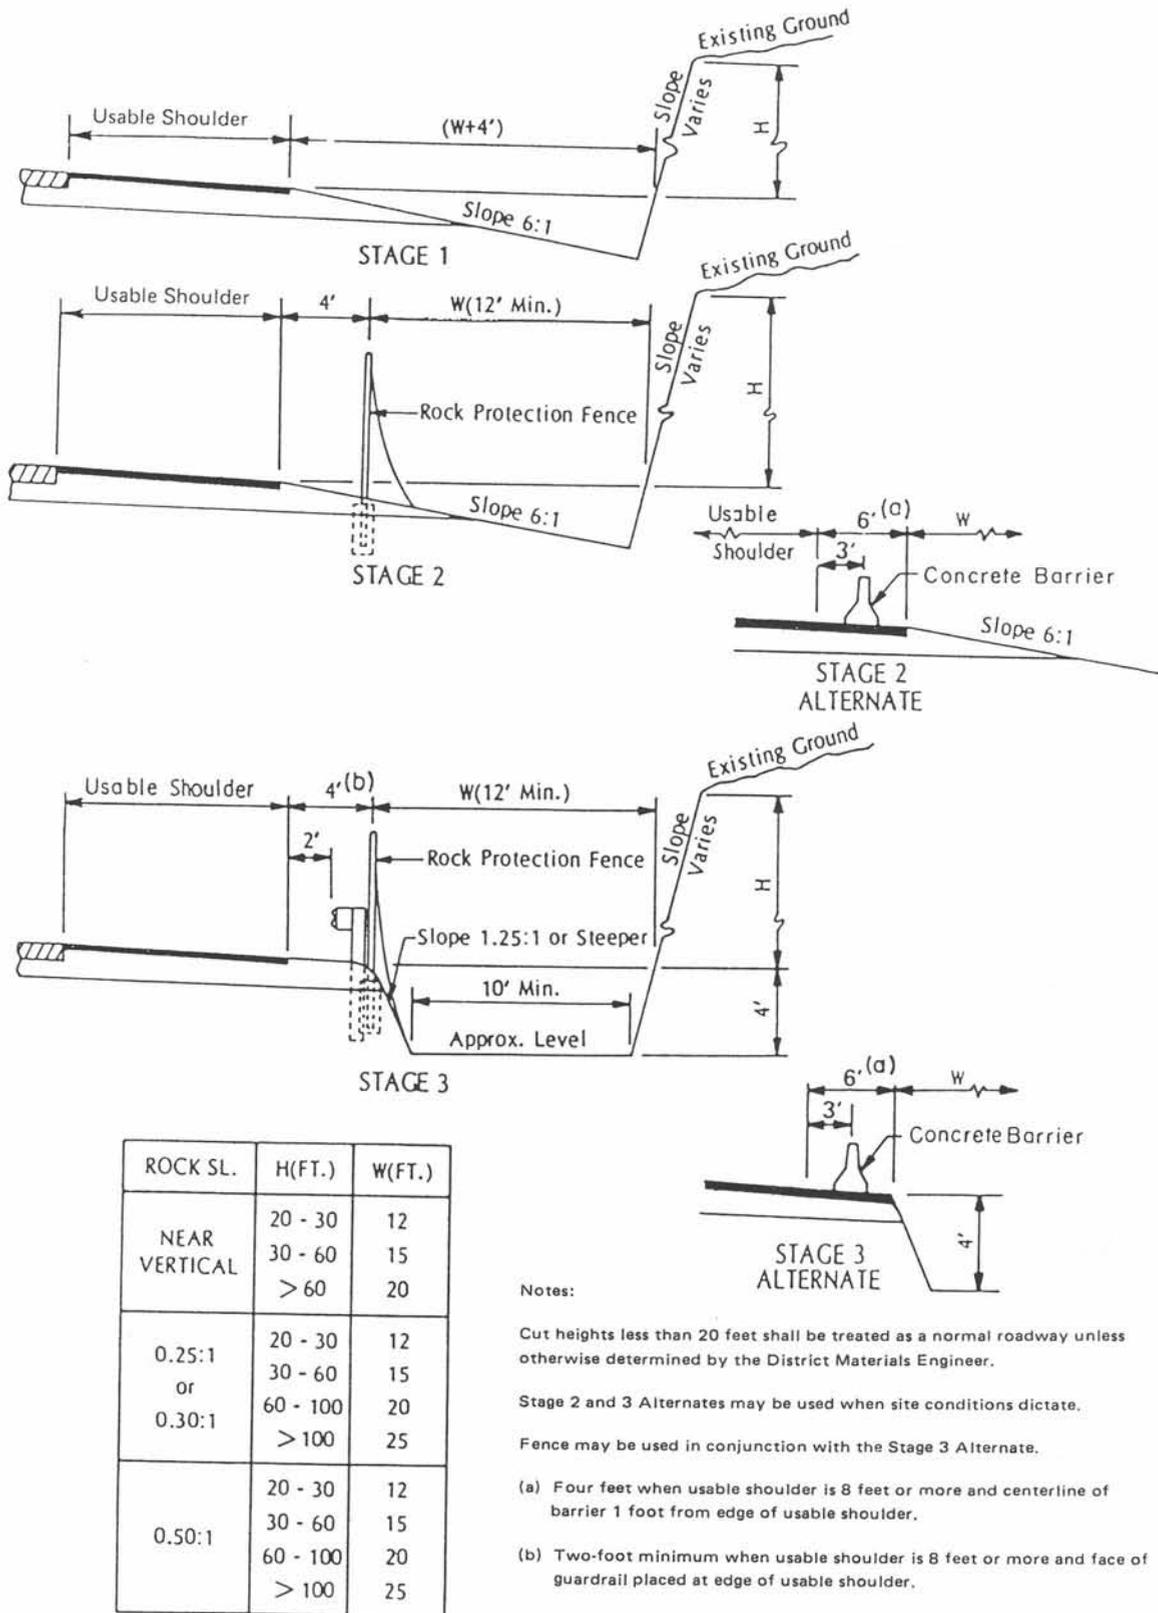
Roadway sections in rock cuts, Design A from Washington State Department of Highways (1968).
